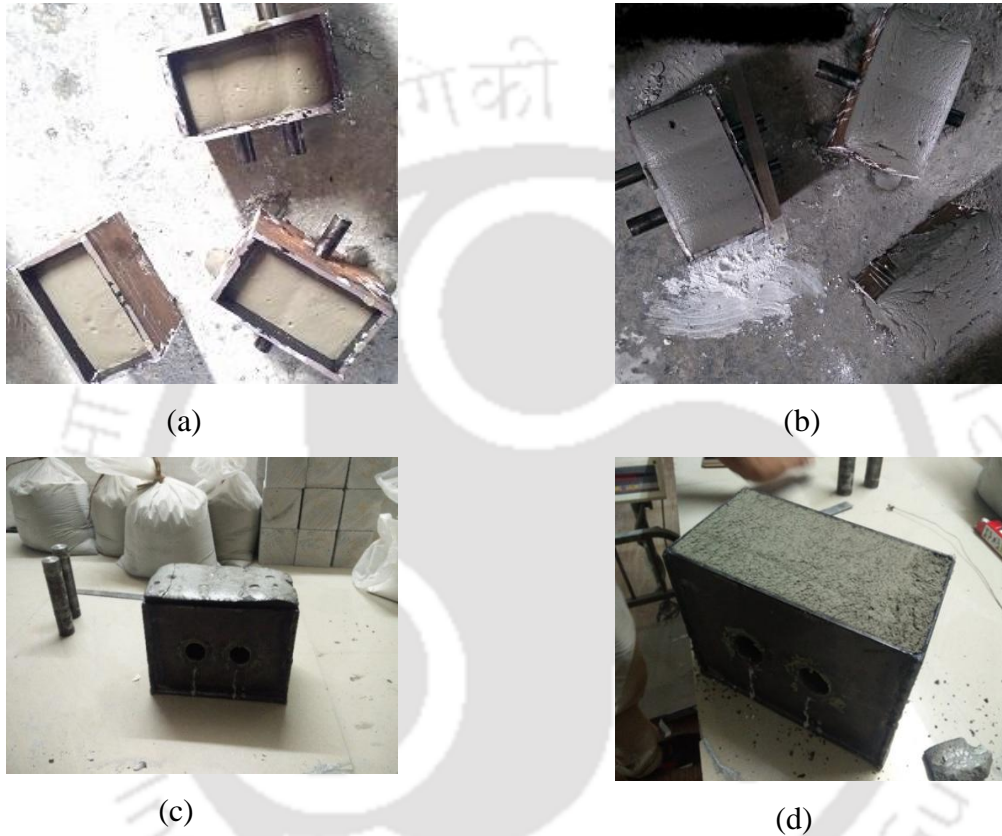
Photograph of miniature molds for producing (a) plain AAC block, (b) single groove AAC block and (c) double groove AAC block
